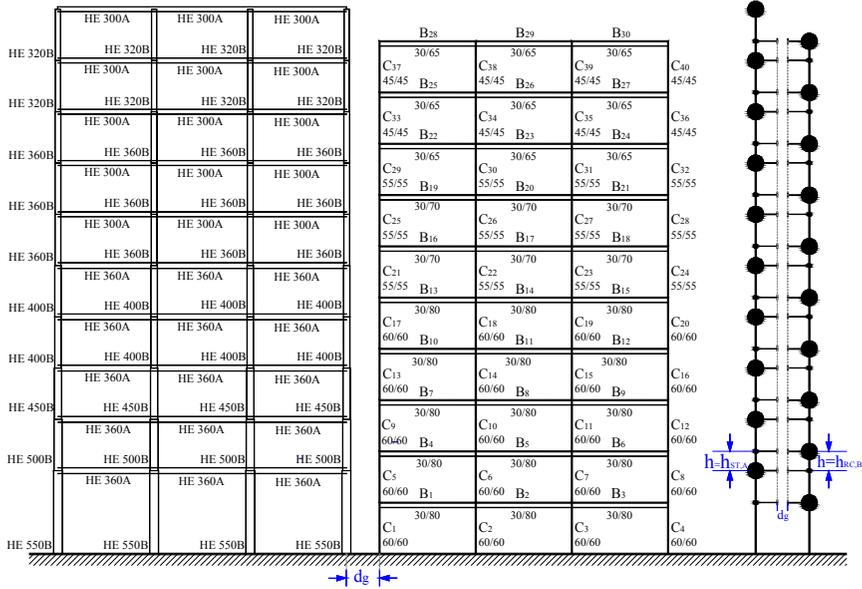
Actual condition and model idealization of pounding between a 10-storey steel (ST) frame and a 10-storey reinforced concrete (RC) frame.
